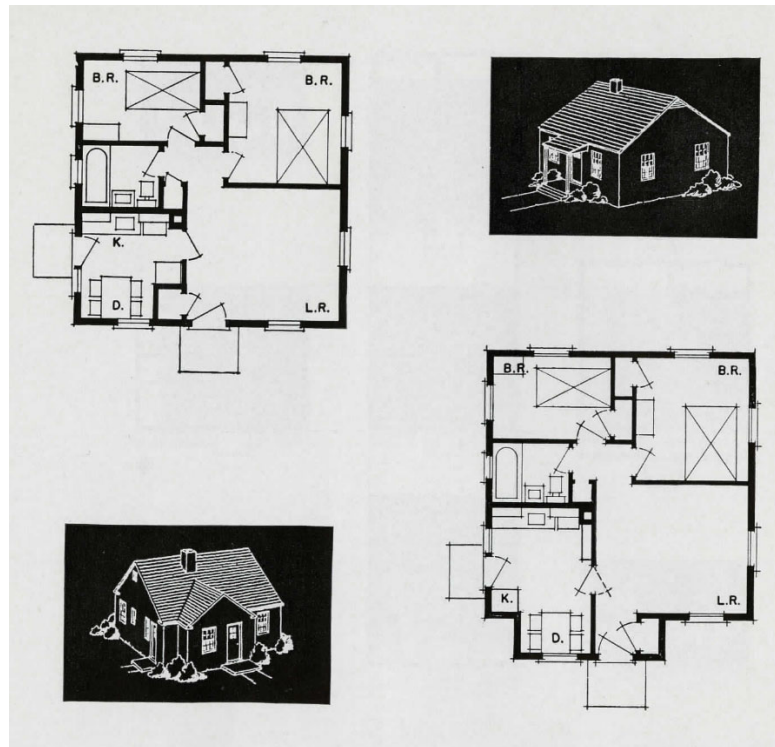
One-story, combined dining-cooking minimum house models from FHA's "Principles of Planning Small Houses," 1940.
